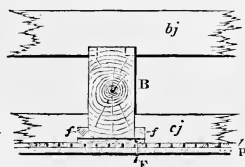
Ceiling Joists supported by Fillets fixed to Binder.
